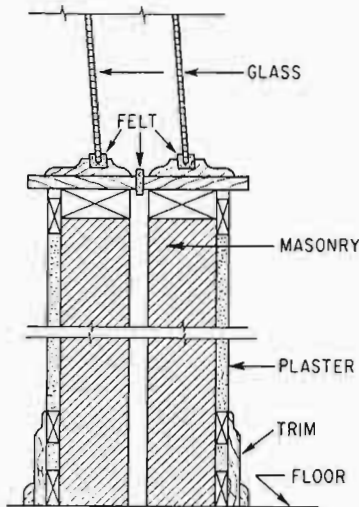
Sound-insulating window construction showing structural separation of double wall. Glass windows in studios and control rooms should be off about 10°, and they should be mounted as shown on a double wall.
